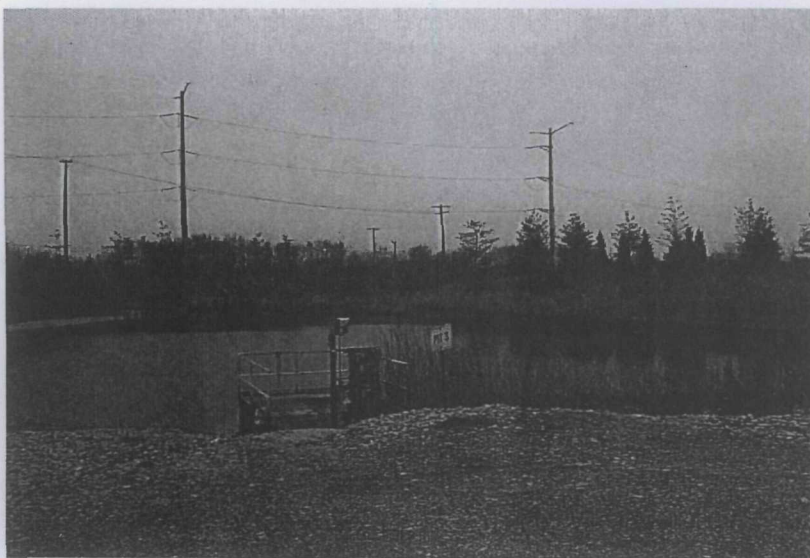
View to the north of the coal pile runoff settling pond (also known as Basin 3 or Pit 3).
